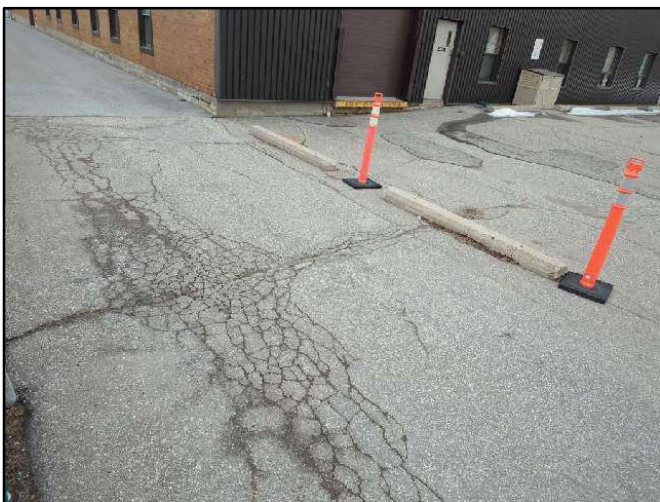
Example of surface deterioration of the asphalt pavement at the north side of the property.
